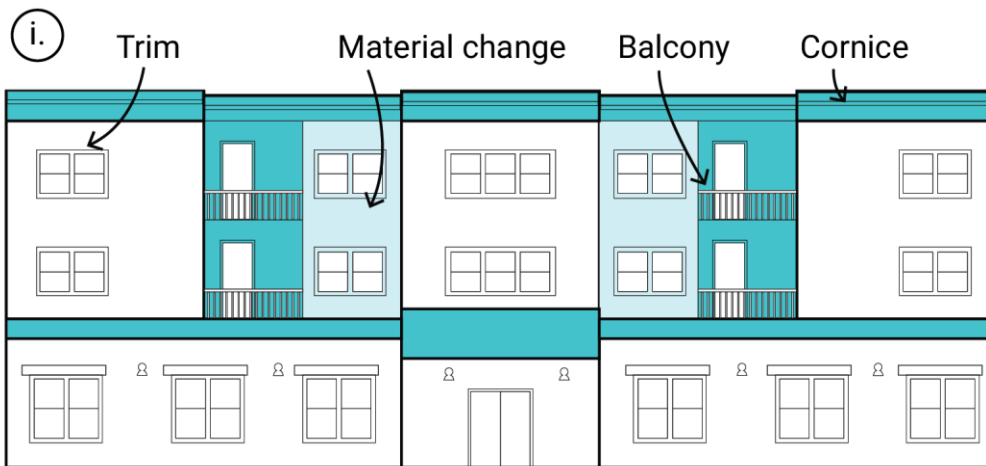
(B)(5)(a)(i): Façade detailing design elements
